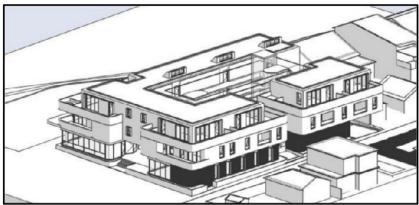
3D view of proposed looking from north-east. May Road and pocket park is on the left (Source: Benson McCormack Architecture, Project No. 1853A)
